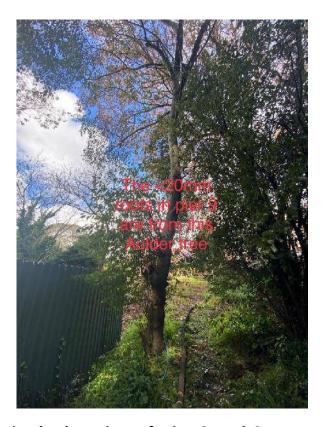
The trees that have their roots in the location of pier 8 and 9.
